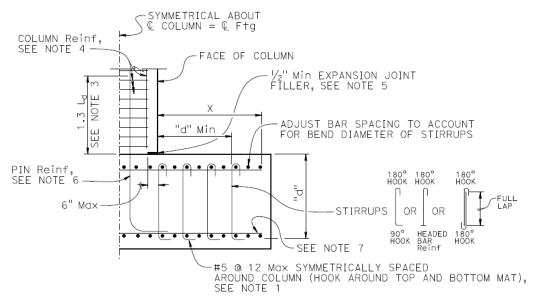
Footing Reinforcement Pinned Column (see also Seismic Design Criteria Figure C6.2.2.5-1)
